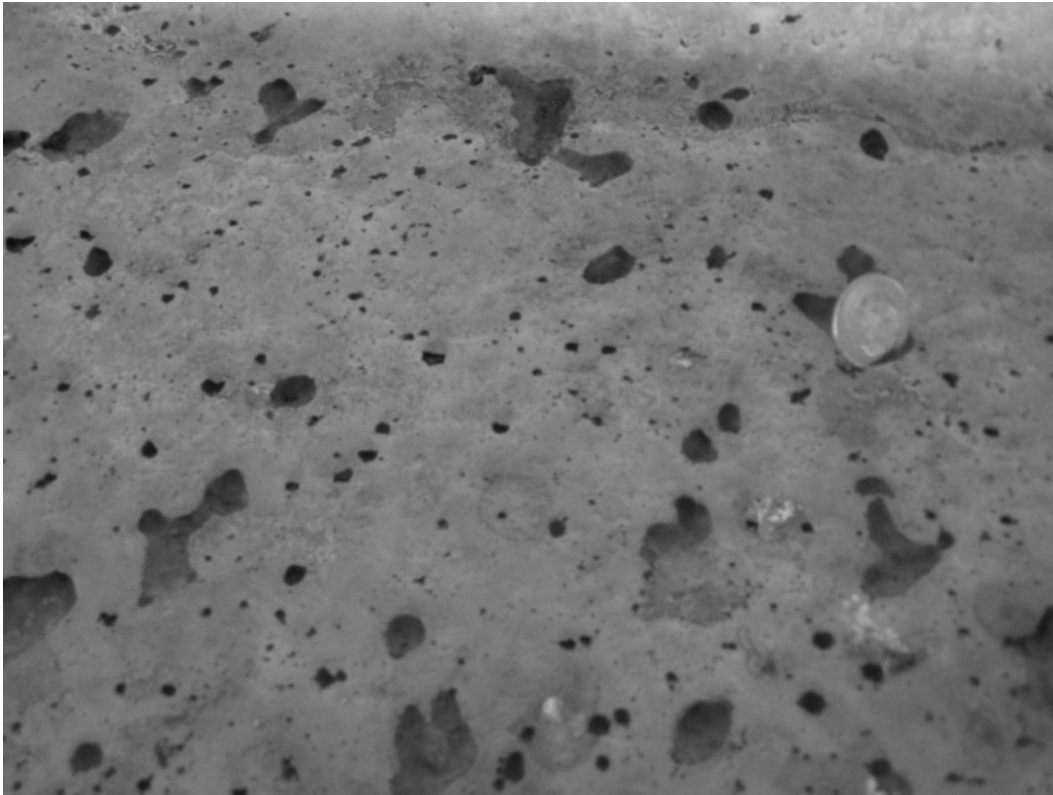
Bug Holes to be Filled with Epoxy Putty (Dime for Size Reference)
